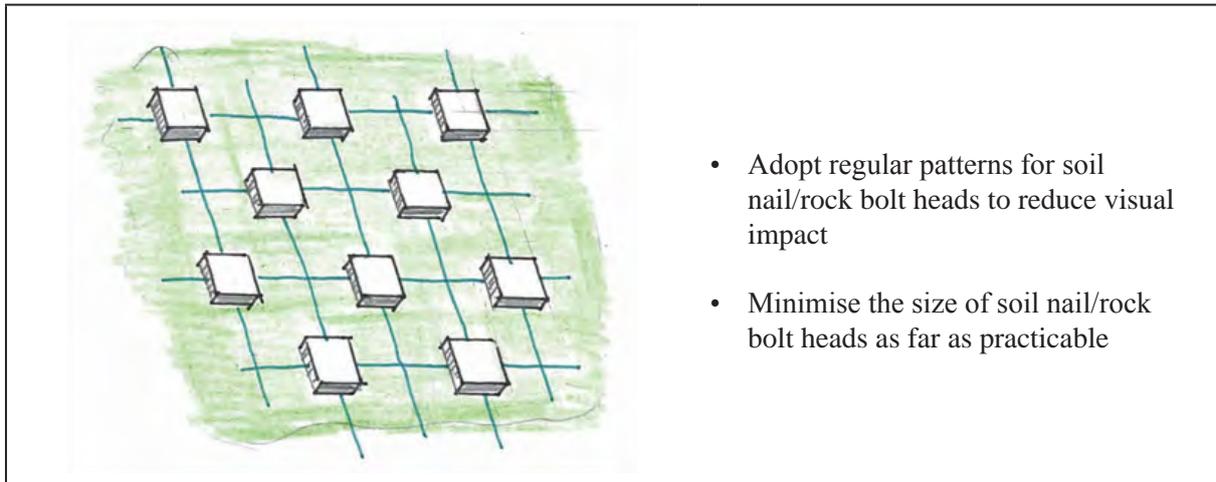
Layout of Soil Nail/Rock Bolt Heads
